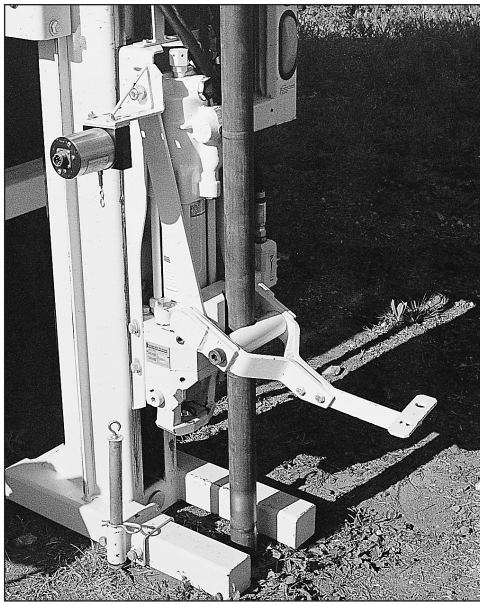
Outer casing may be retrieved with a pull cap or rod grip pull system if the probe hole is sealed with granular bentonite.
